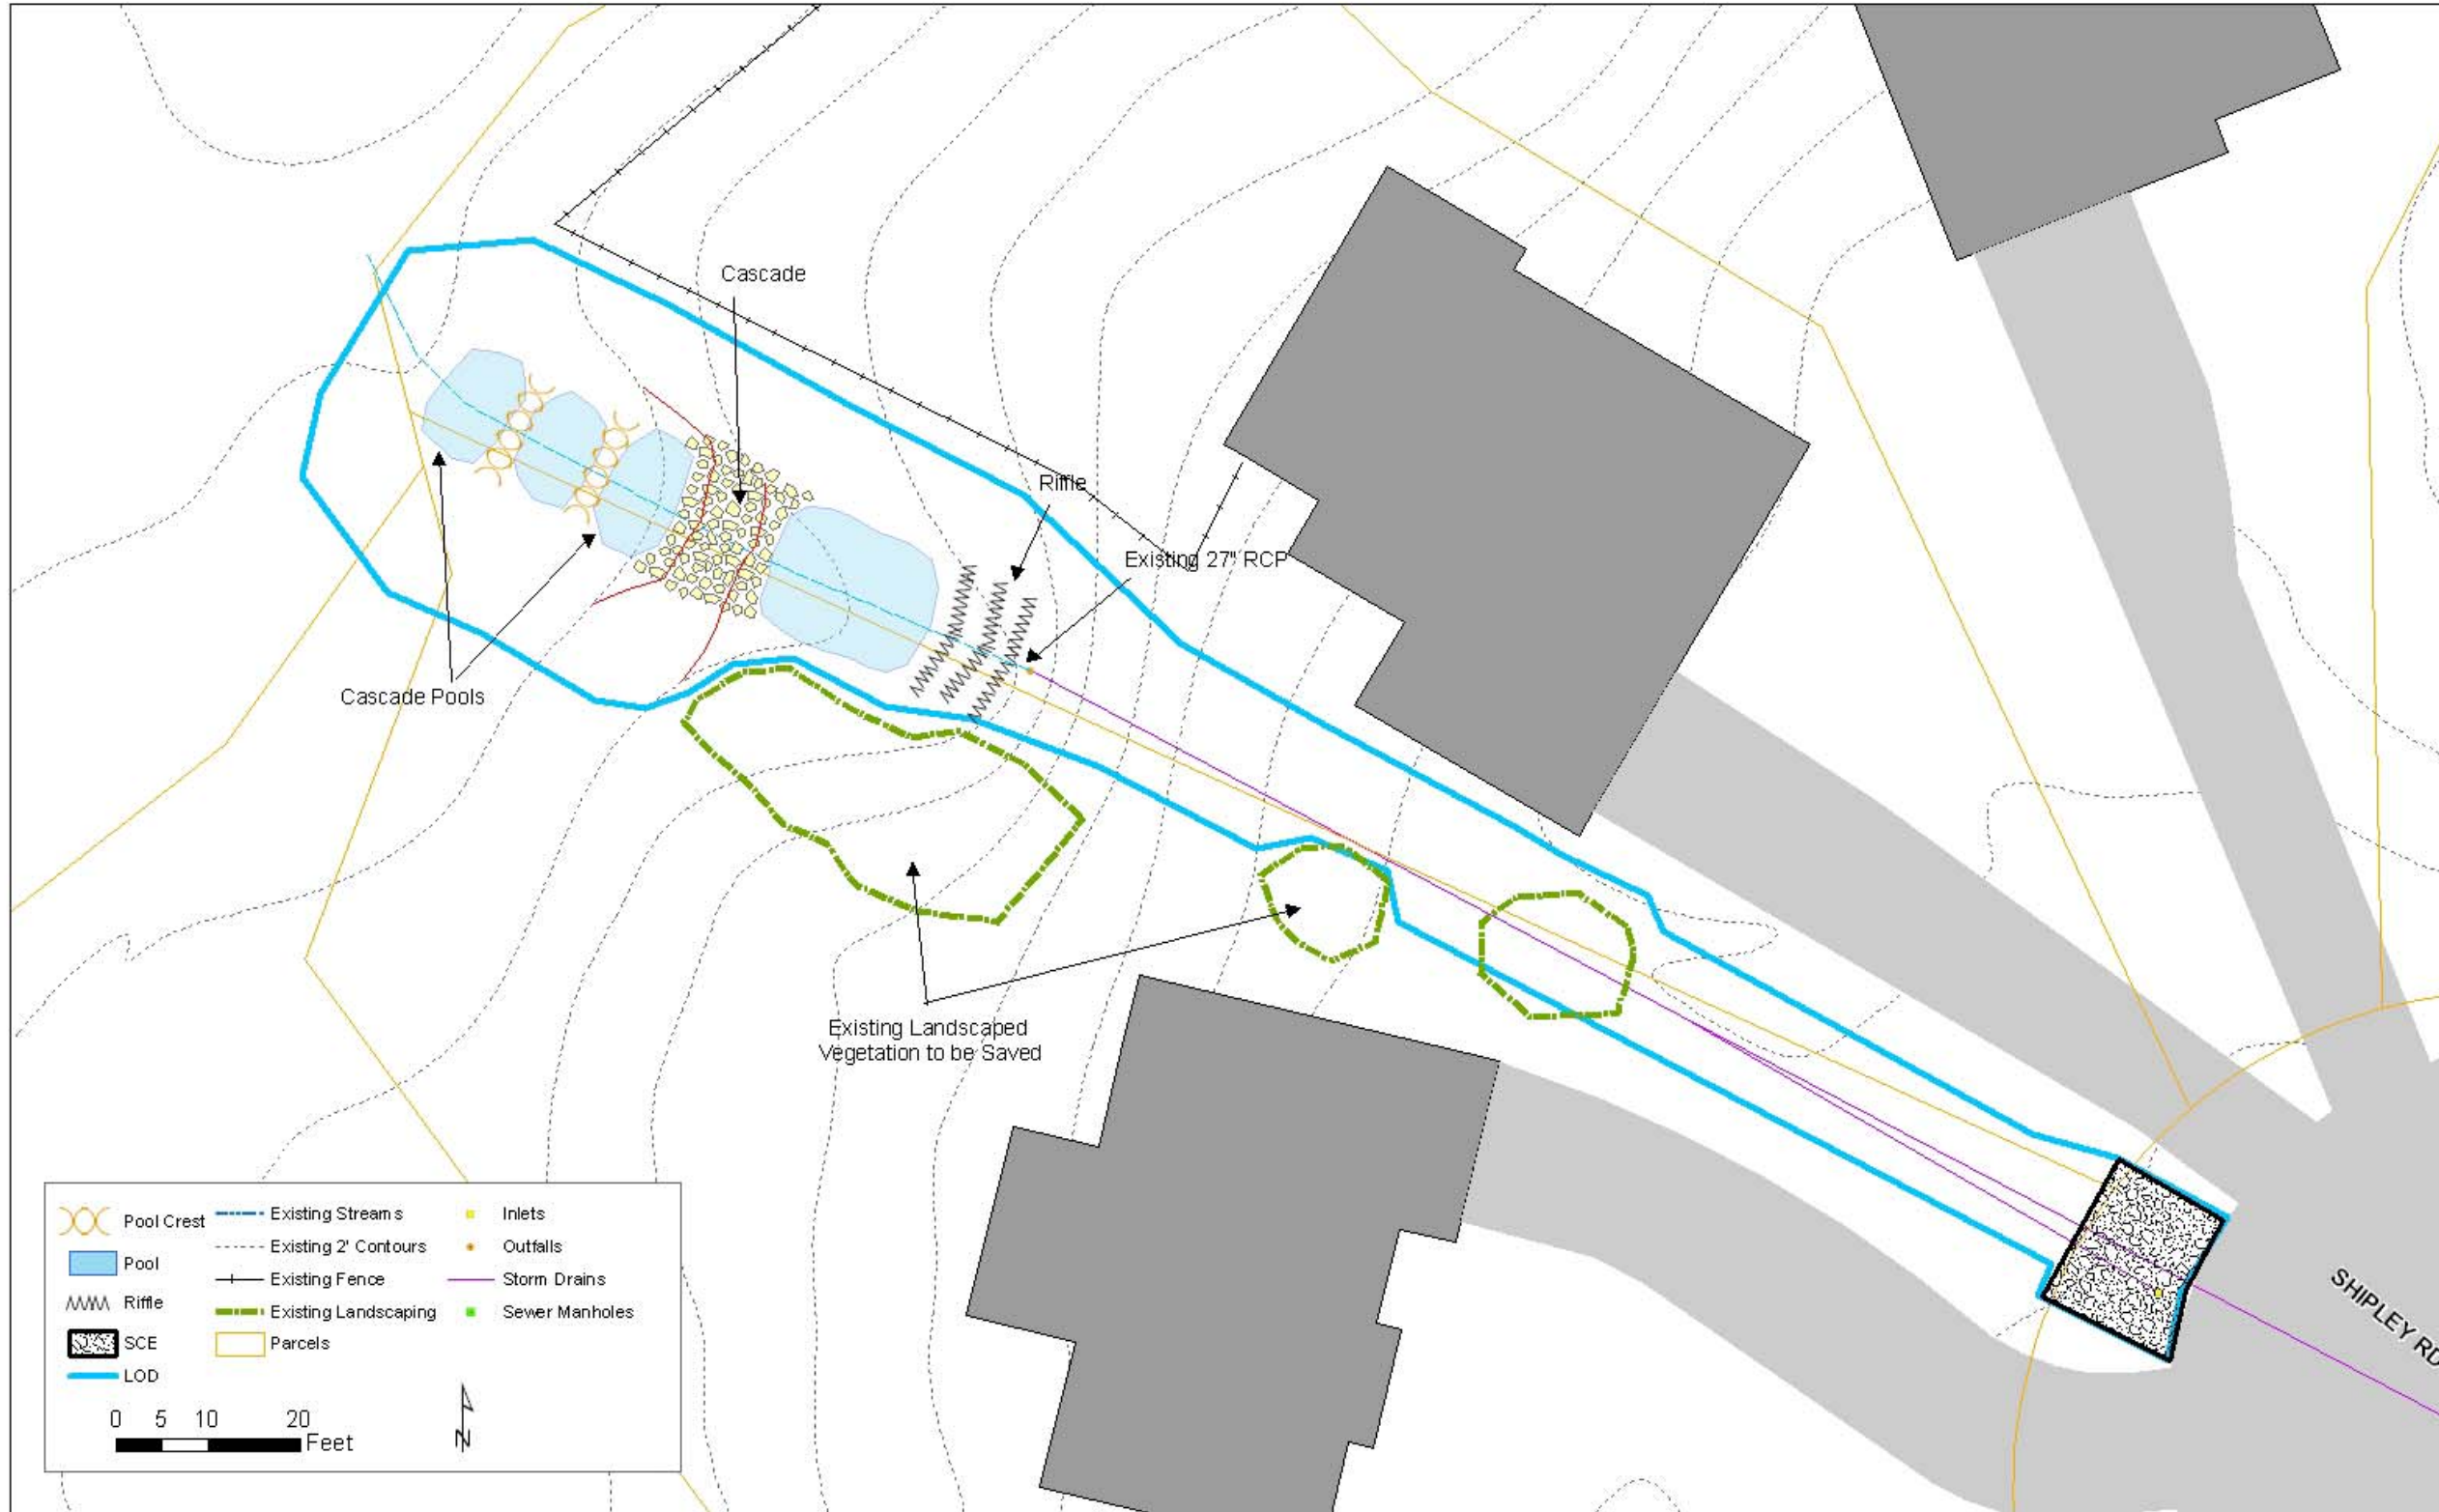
CONCEPTUAL DESIGN PLAN SITE SKETCH
